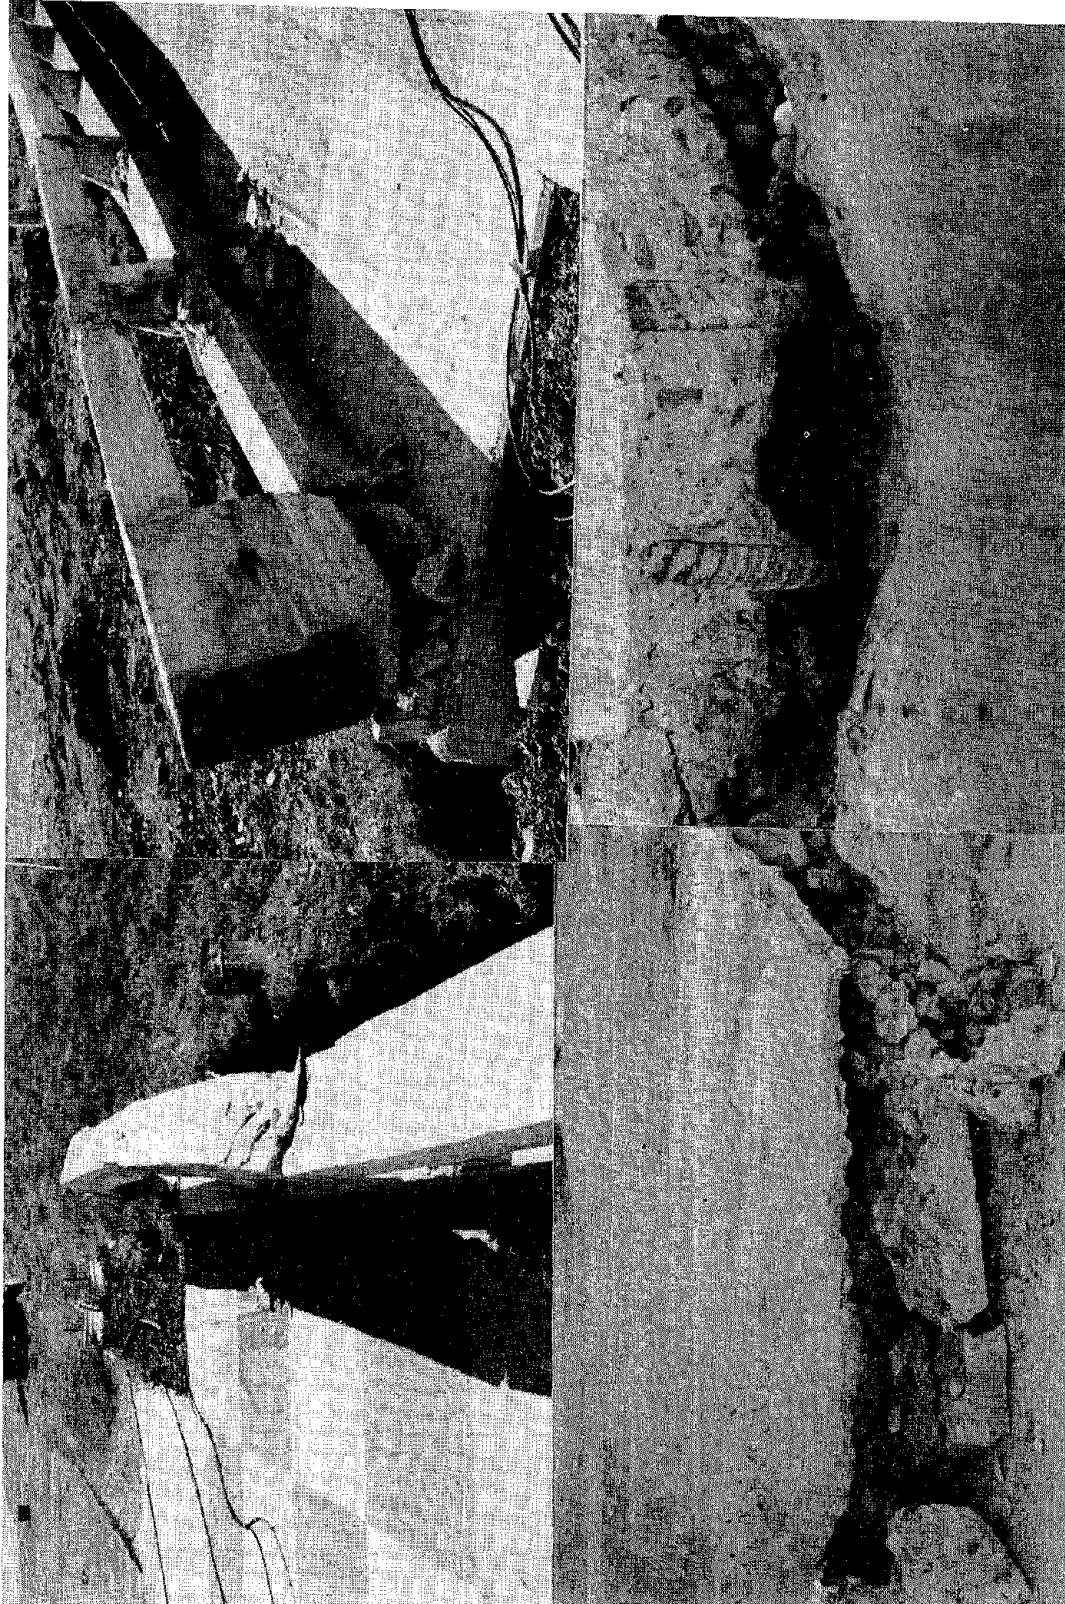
VIEWS OF TEST RF-3 INSTALLATION DAMAGE
